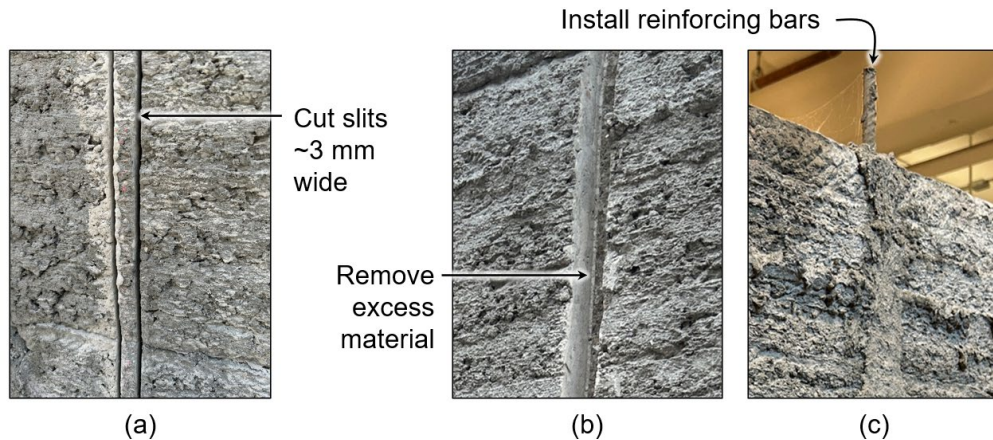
Typical installation of NSM reinforcement: (a) cut grooves in wall panel, (b) partially fill groove with adhesive, and (c) install reinforcing bar and fill remaining area with adhesive.
